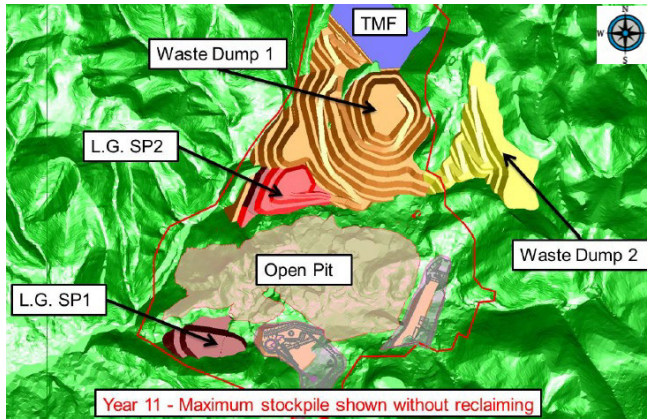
Locations for waste dumps and low grade stockpiles [6]
